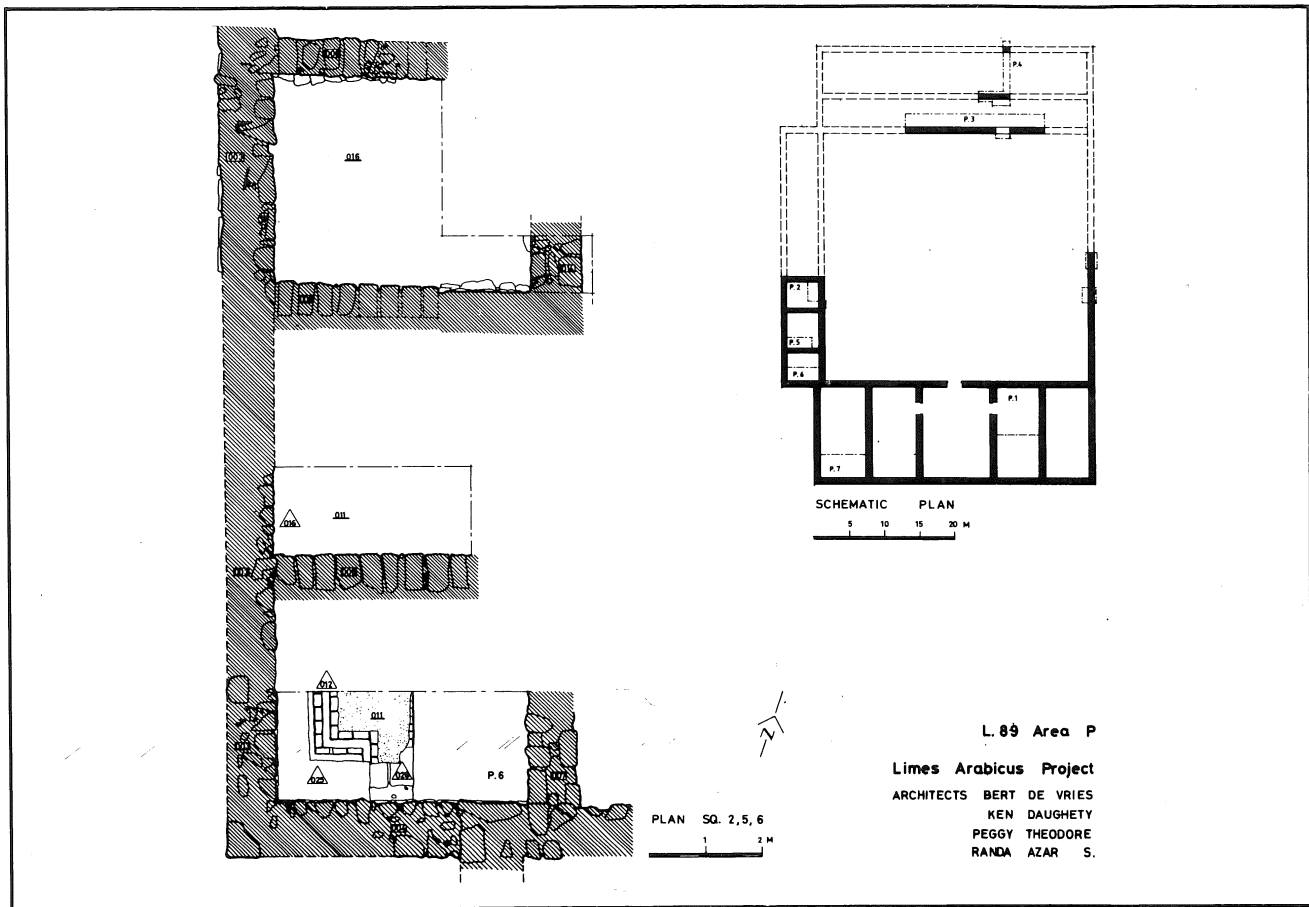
Plans of the East Vicus building. Plan on the left shows details of the western range of rooms (P.2, 5, 6).
